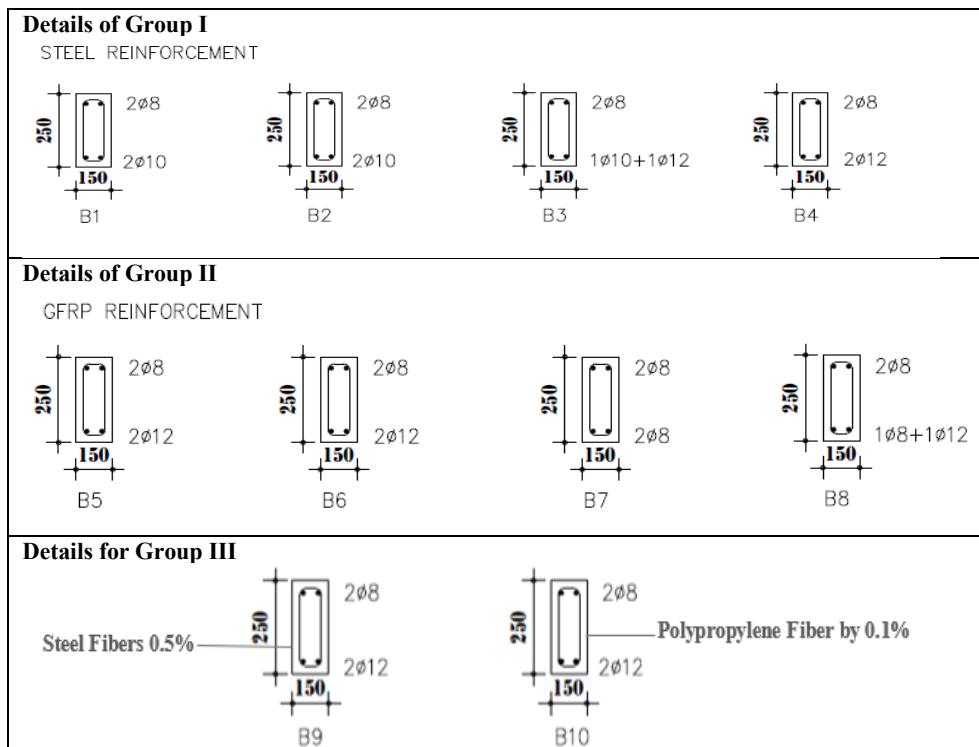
Details of reinforcement for the tested beams B1 to B10.
